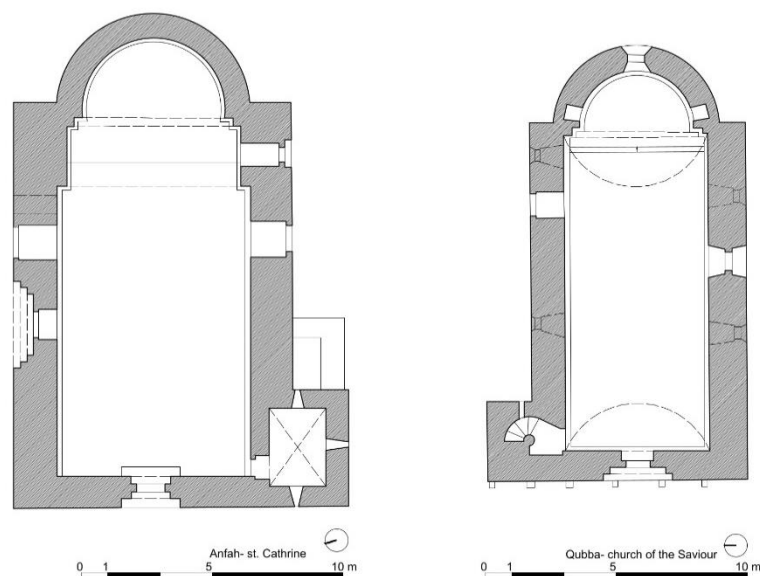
Floor plan of St Catherin church ' Anfah and the floor plan of St. Saviour church Qubba drawn by the author.
